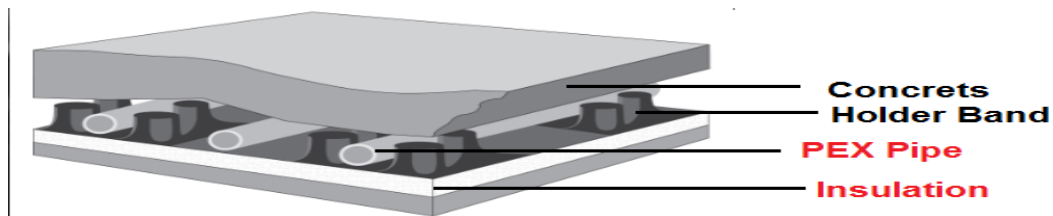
concrete floor on insulation. Pipe loops laid on plastic holder band
